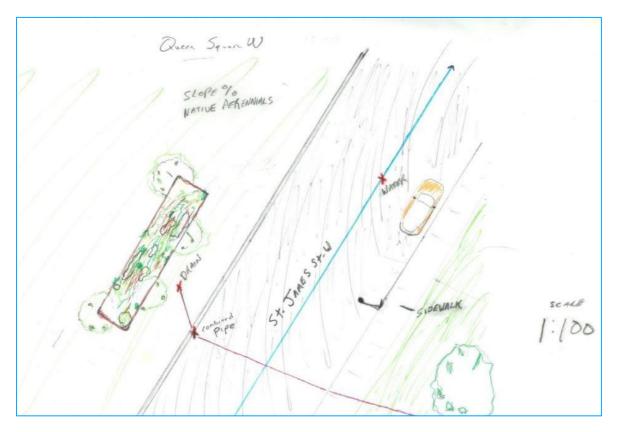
Site plan of a proposed rain garden in Queen's Square West.
